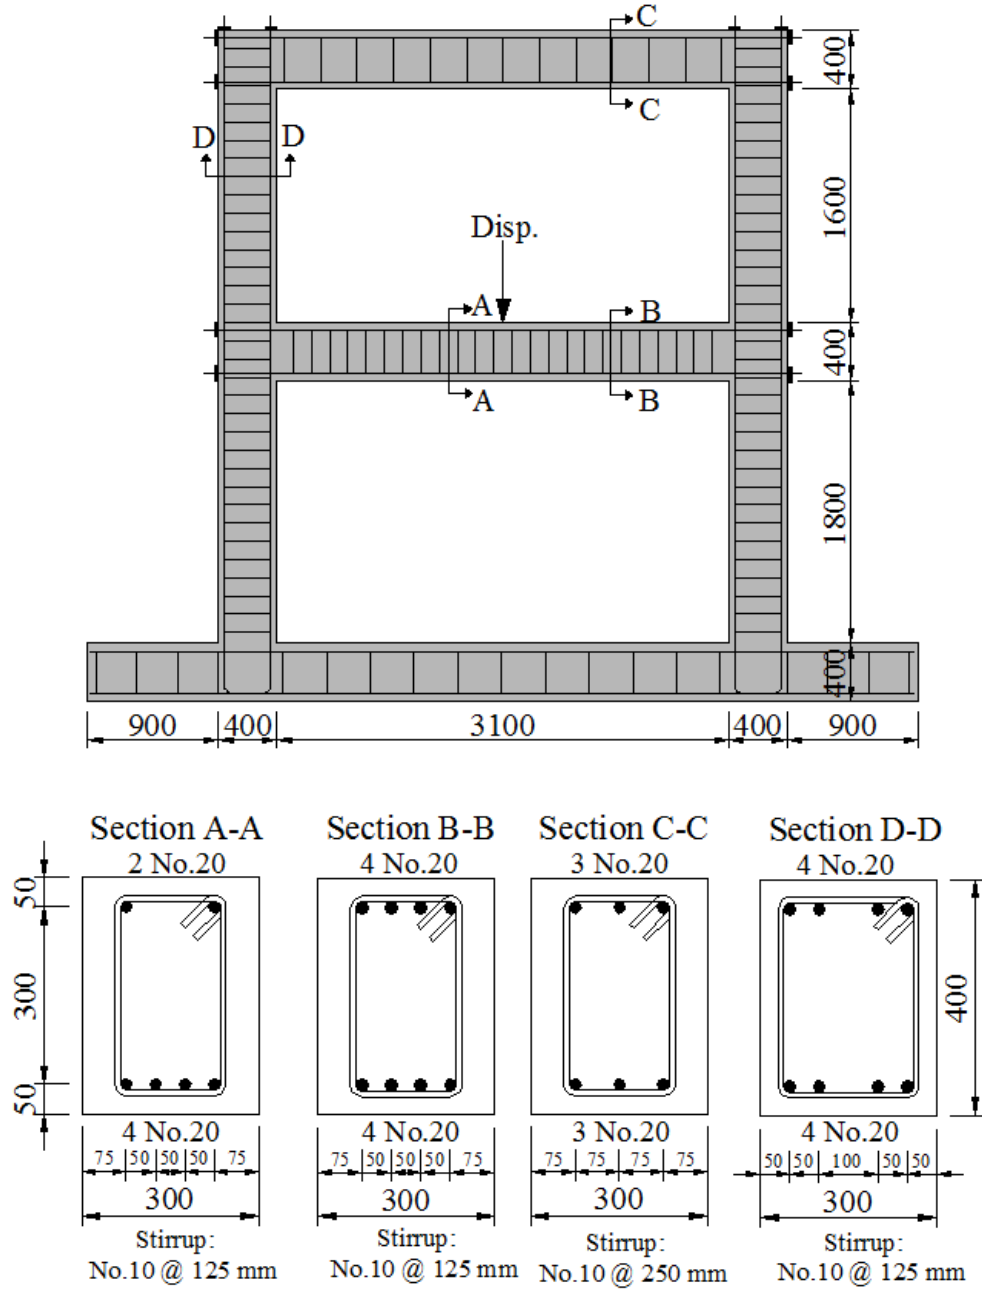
Structural Details of Vecchio and Balopoulou Frame
